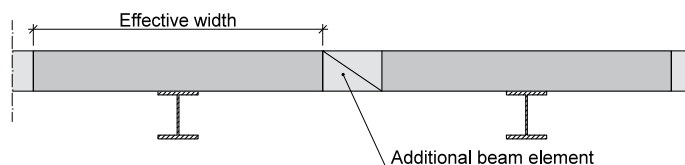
Cross section of the deck and steel beams in the transversal direction showing the effective width of the composite section and the additional transversal beam element.
